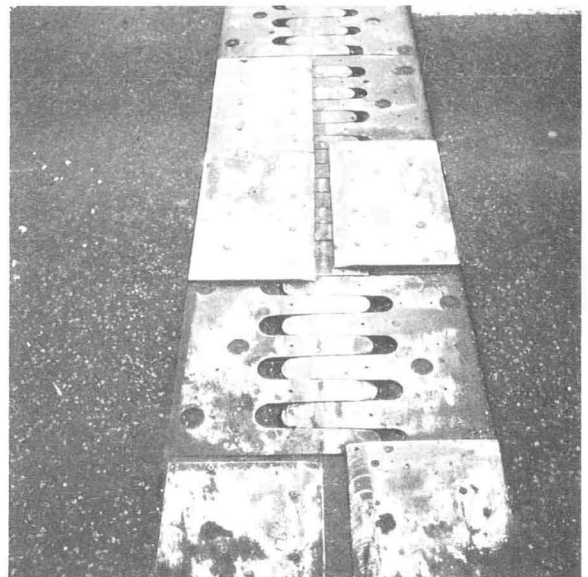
C. Tay Bridge-Typical distress at finger joints. Opened to traffic in August 1966.
